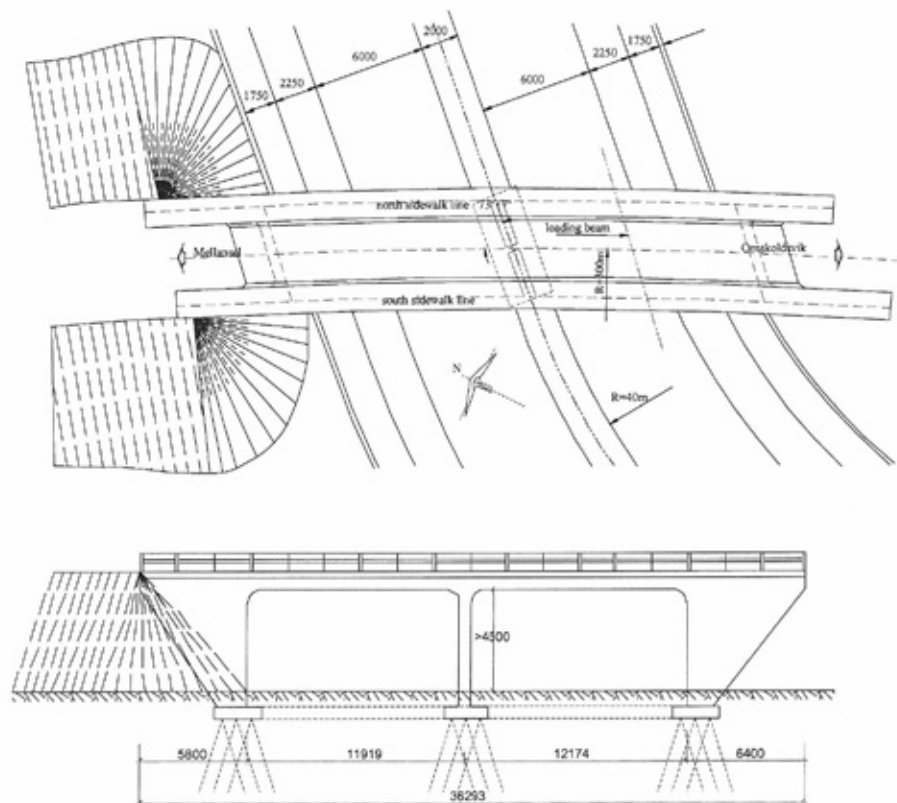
Plan and elevation of tested bridge with landfill removed at SE wings
